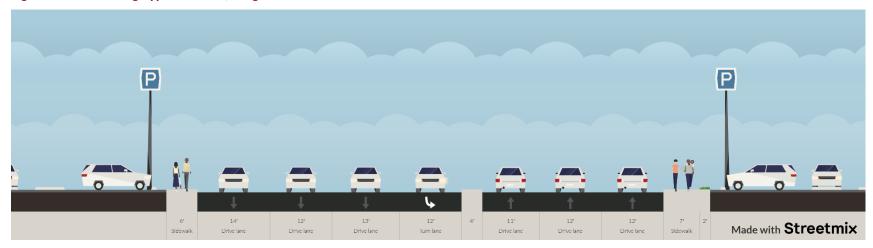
Proposed Action Typical Section, Niagara Falls Boulevard at Boulevard Mall Station
